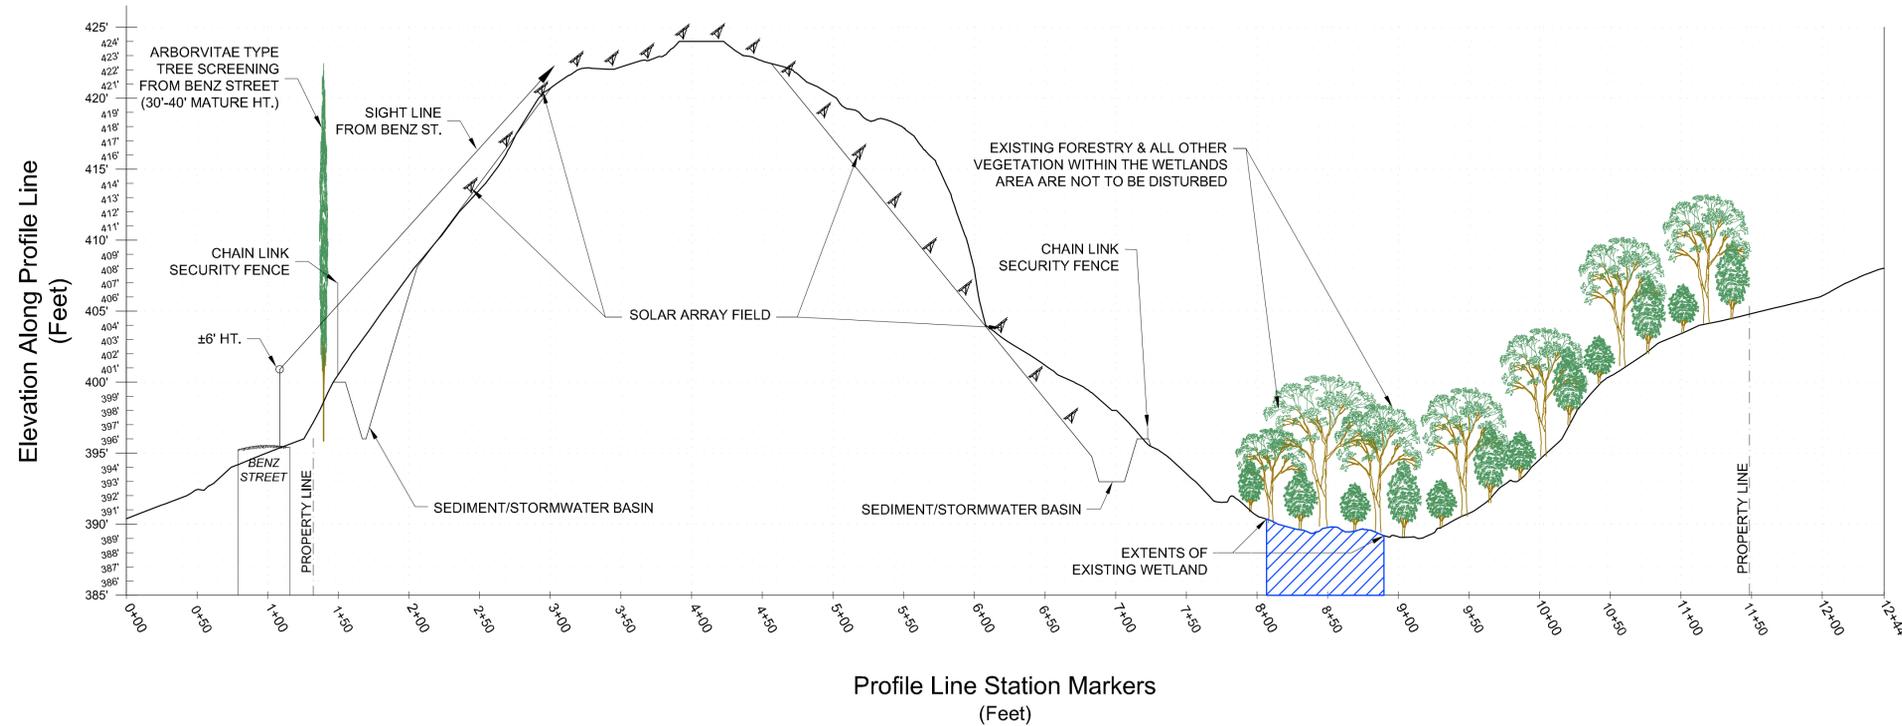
EXHIBIT B: PROJECT CROSS SECTION (SOUTHERN SITE VIEW)
